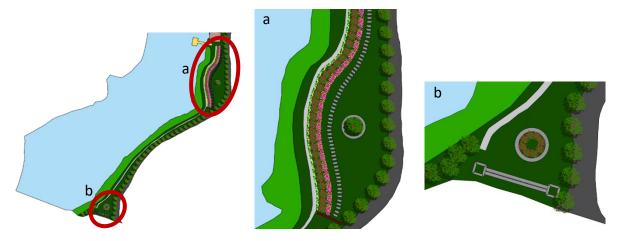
a. Flower Garden, b. Entrance of the park and walkway
